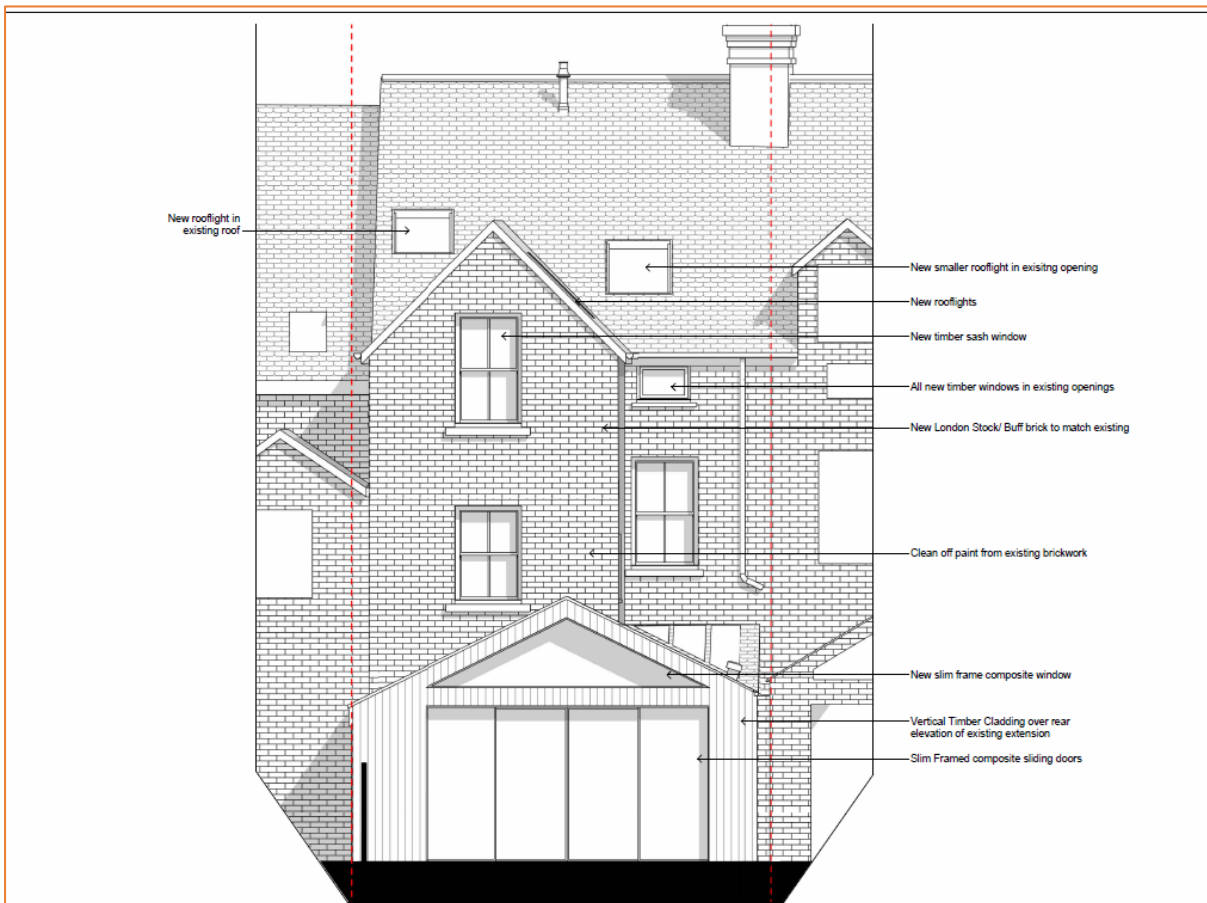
Proposed Rear Elevation (Source: Gresford Architects)
